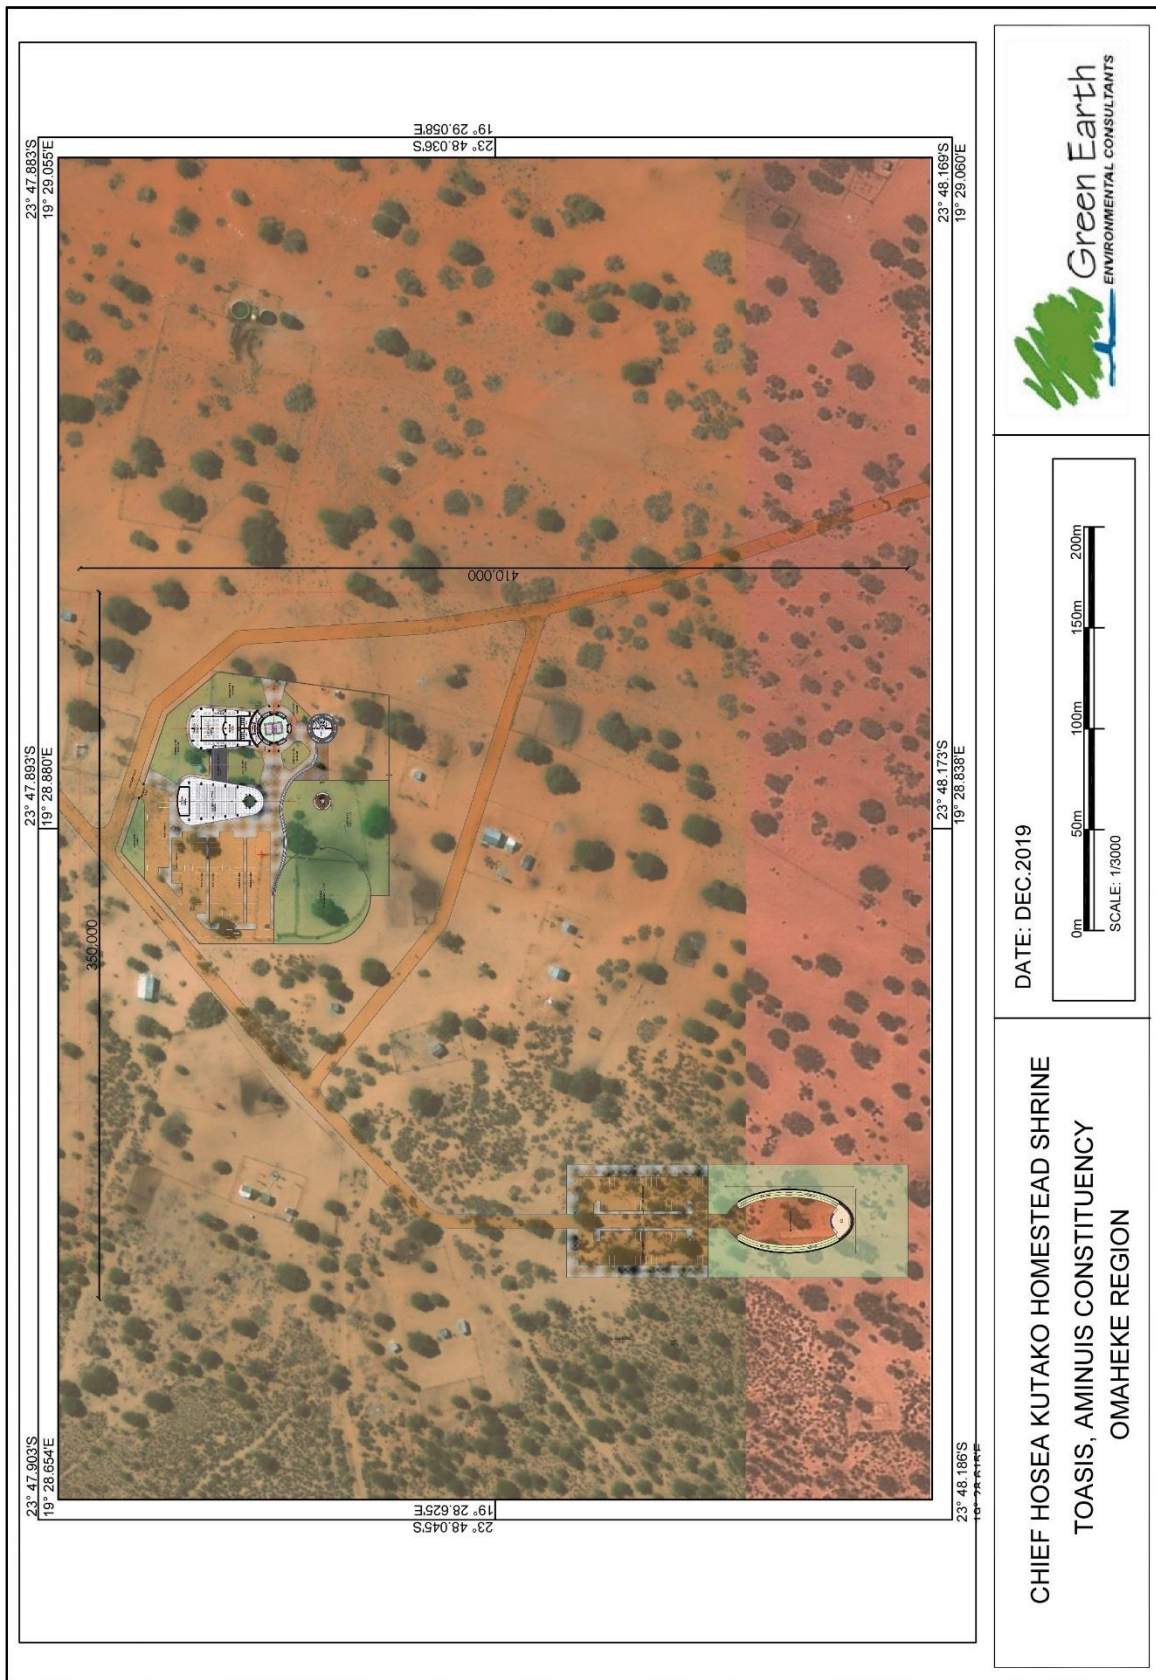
Site Layout Plan (Mali Tjitjo Architects)
